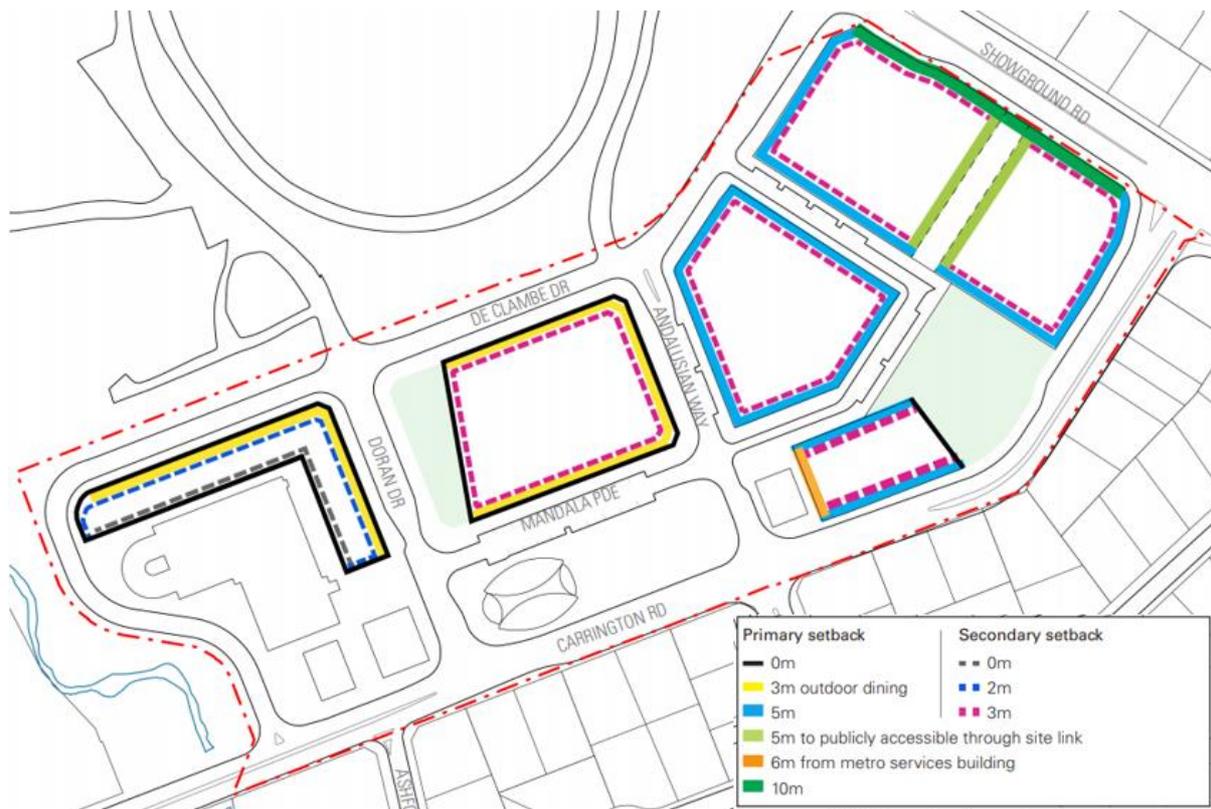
| Approved street and tower setbacks (Source: Concept Approval)
